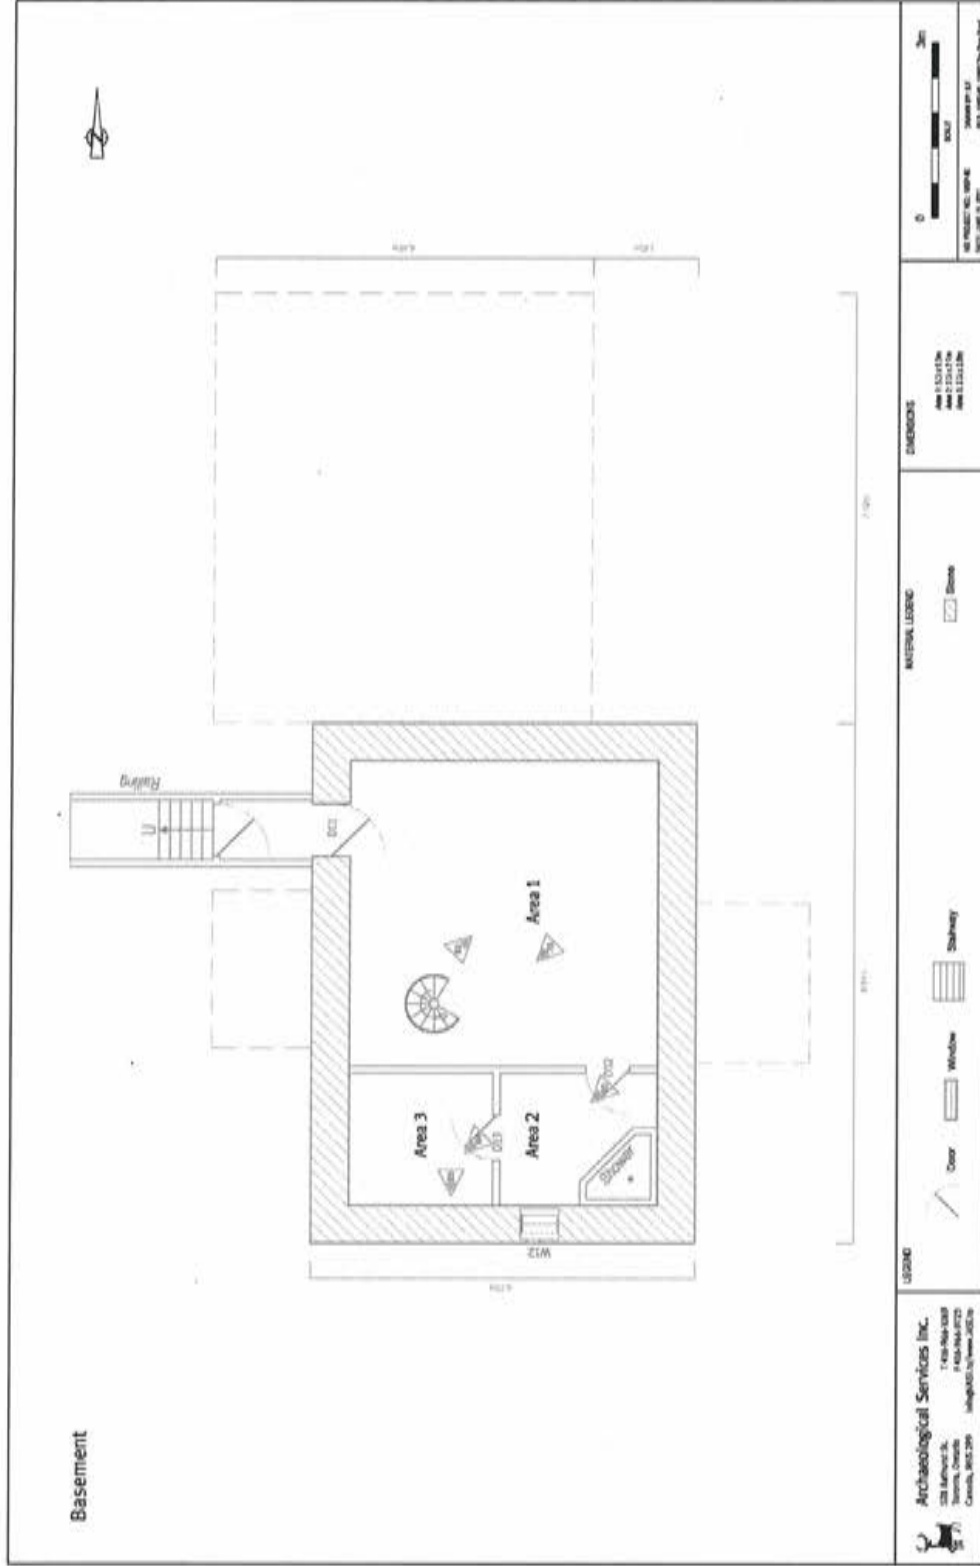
Interior floor plan of basement showing overall dimensional measurements of residential exterior and internal rooms.
